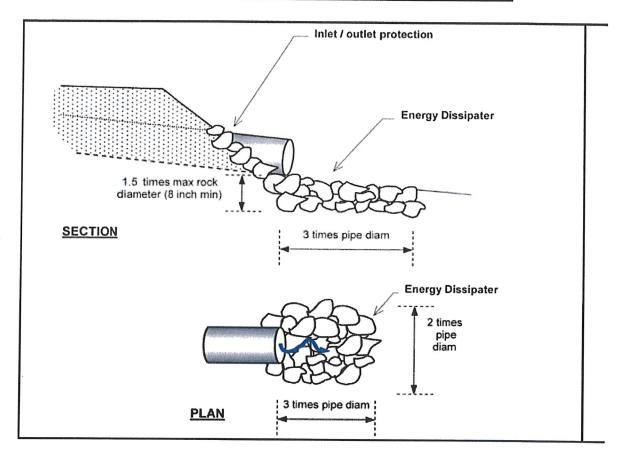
A. Riprap armor at culvent outlet (Modified from: Kellar et al., 2011).
